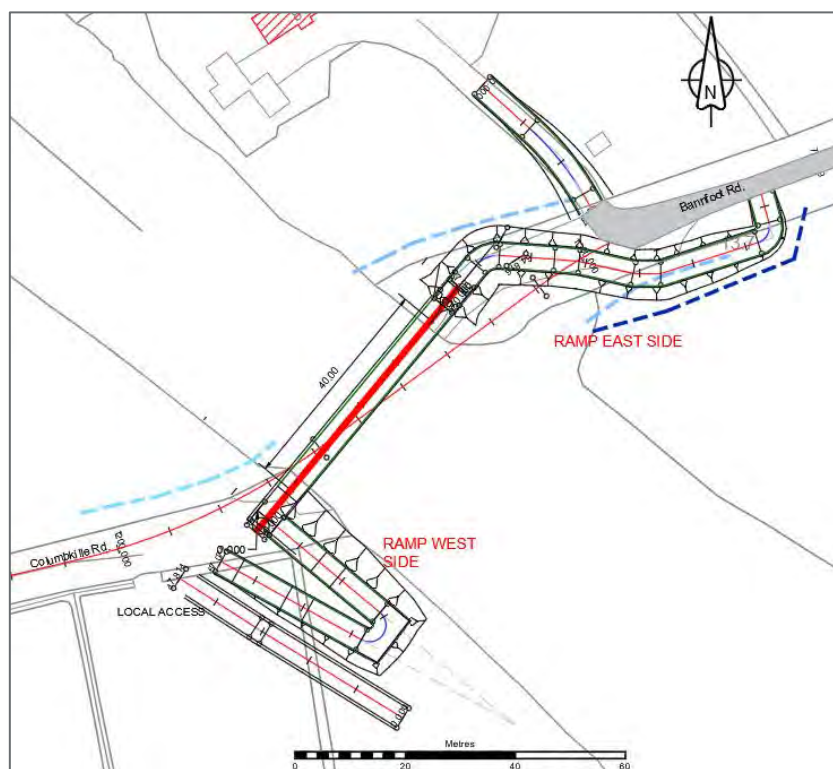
Proposed Pedestrian/Cycle Bridge Arrangement
